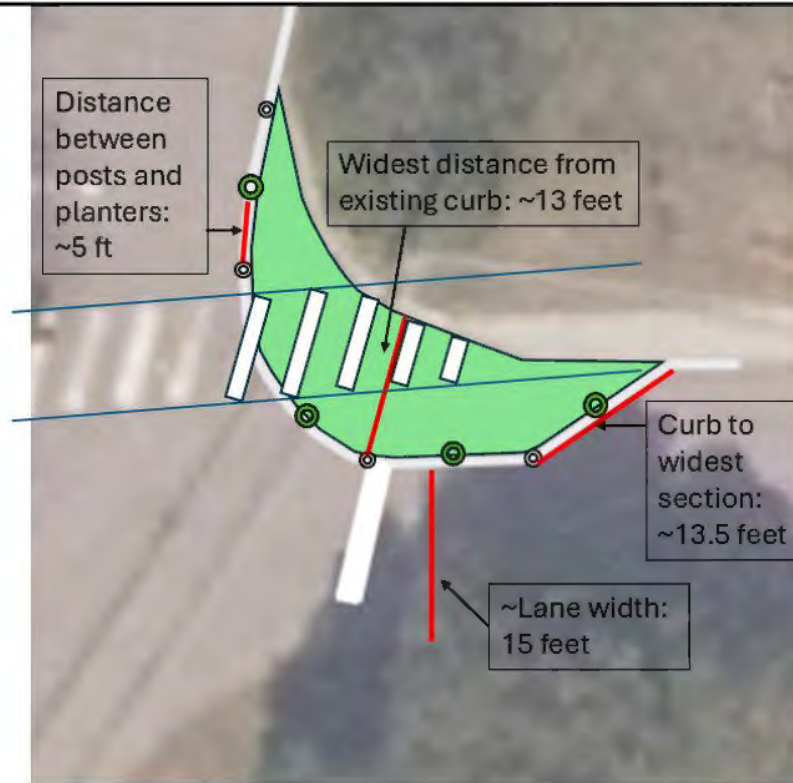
Option 1's installation plan for the intersection of Lincoln Street and Lincoln Terrace
